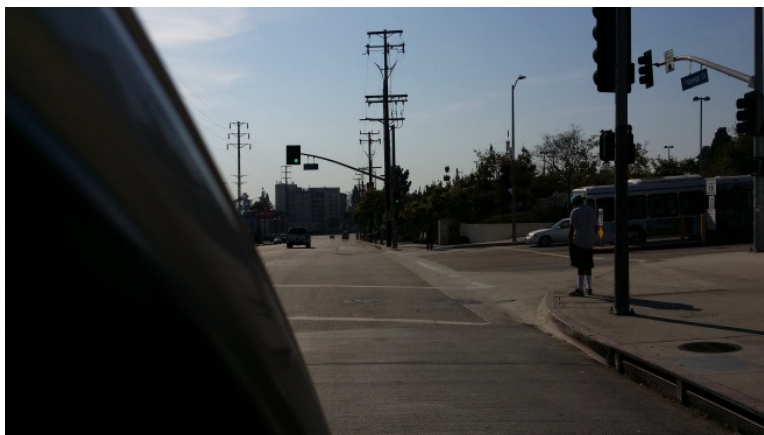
Storm Drain Inlet with Screens Along Marengo Street at State Street Intersection
